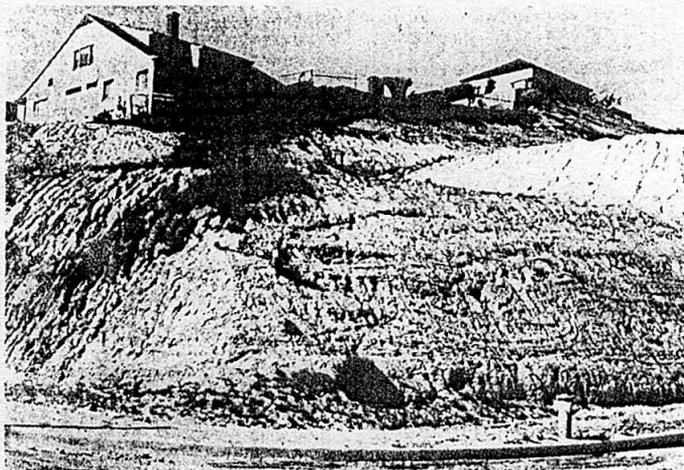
Northwest corner of Krim Drive and Beverlywood Street looking northwest. Contact of Anchor silt and Medill sand is few feet above bench cut on lot in foreground. Contorted bedding shows above fireplug.
